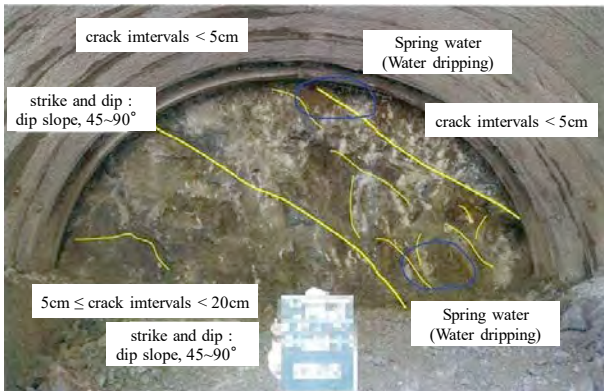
An example of tunnel face sketch in the tunnel face observation data sheet
